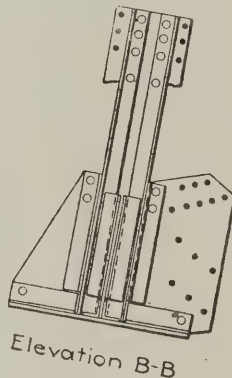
DETAIL OF UPPER SECTION OF TOWER COLUMN.
